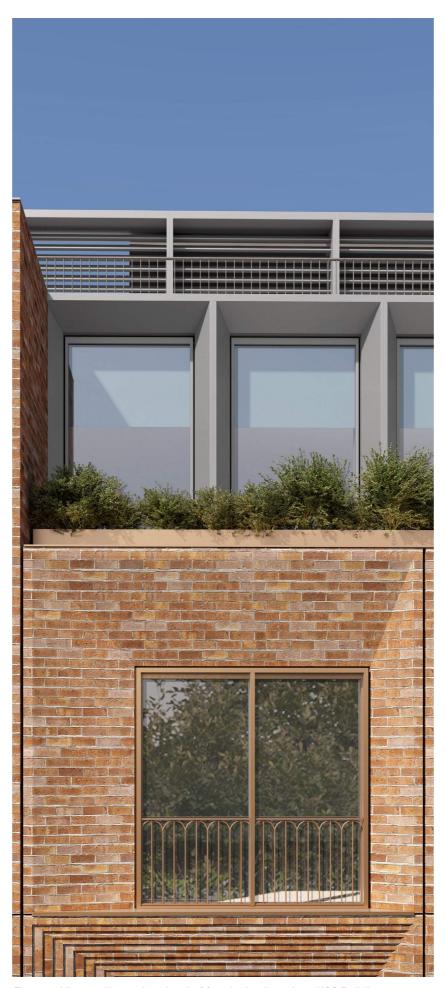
View 3 - Illustrative visual of facade detail study to KCS Building
